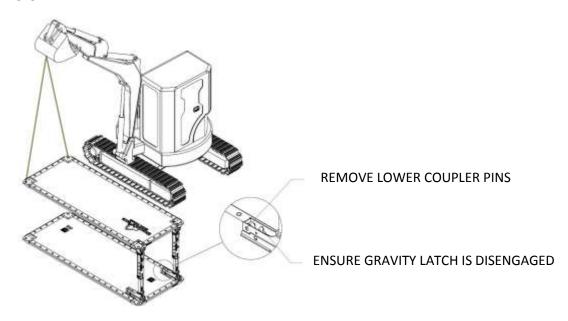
Disassembly Step Four – Remove Bottom Coupler Pins
